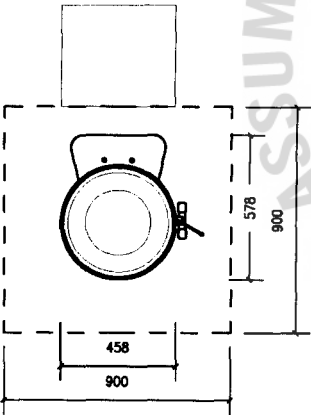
WHEEL TABLE DIMENSION
